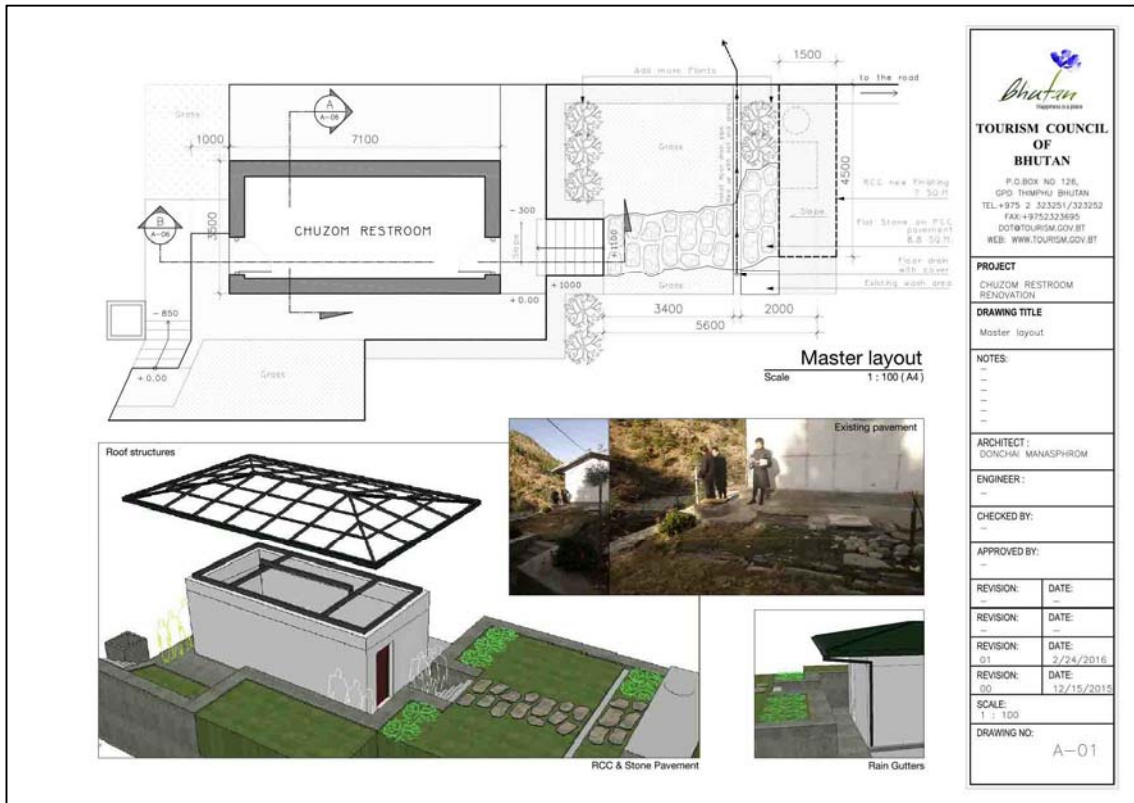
Renovation drawing of Chuzom restrooms (Thimphu-Paro highway)
